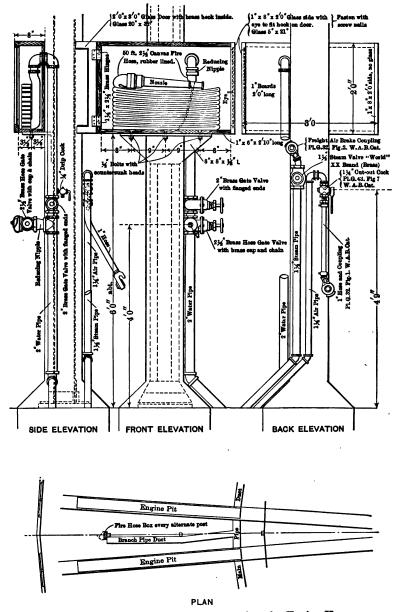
Steam, Air and Water Connections for Engine Houses.
